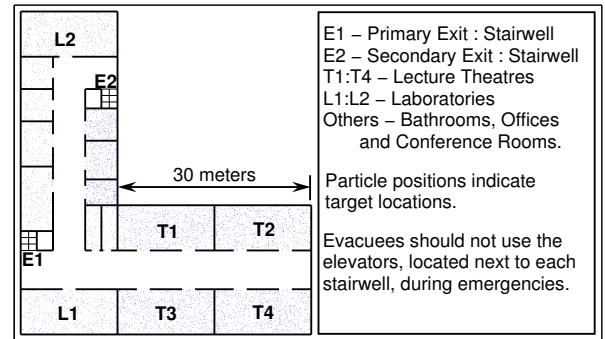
Floor plan of a section of the Department of Engineering Science building at Kyoto University.
